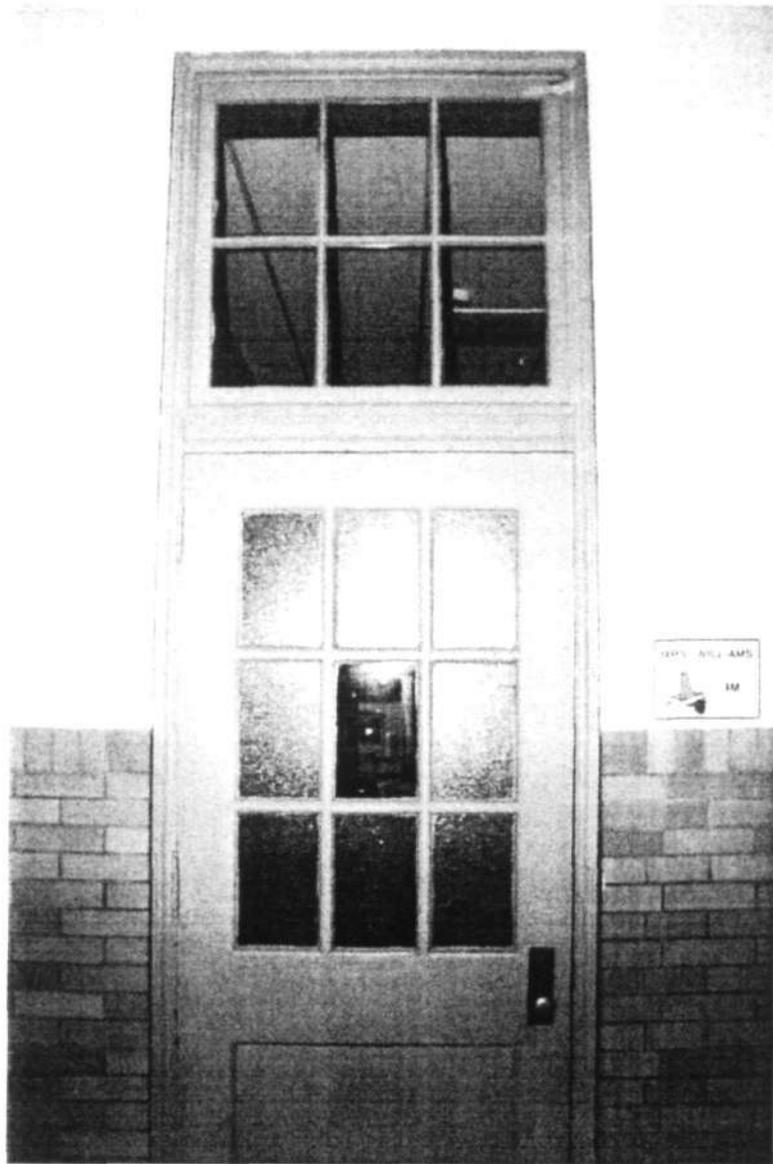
View an interior classroom door located on the first floor of building MB 1937, facing southeast
